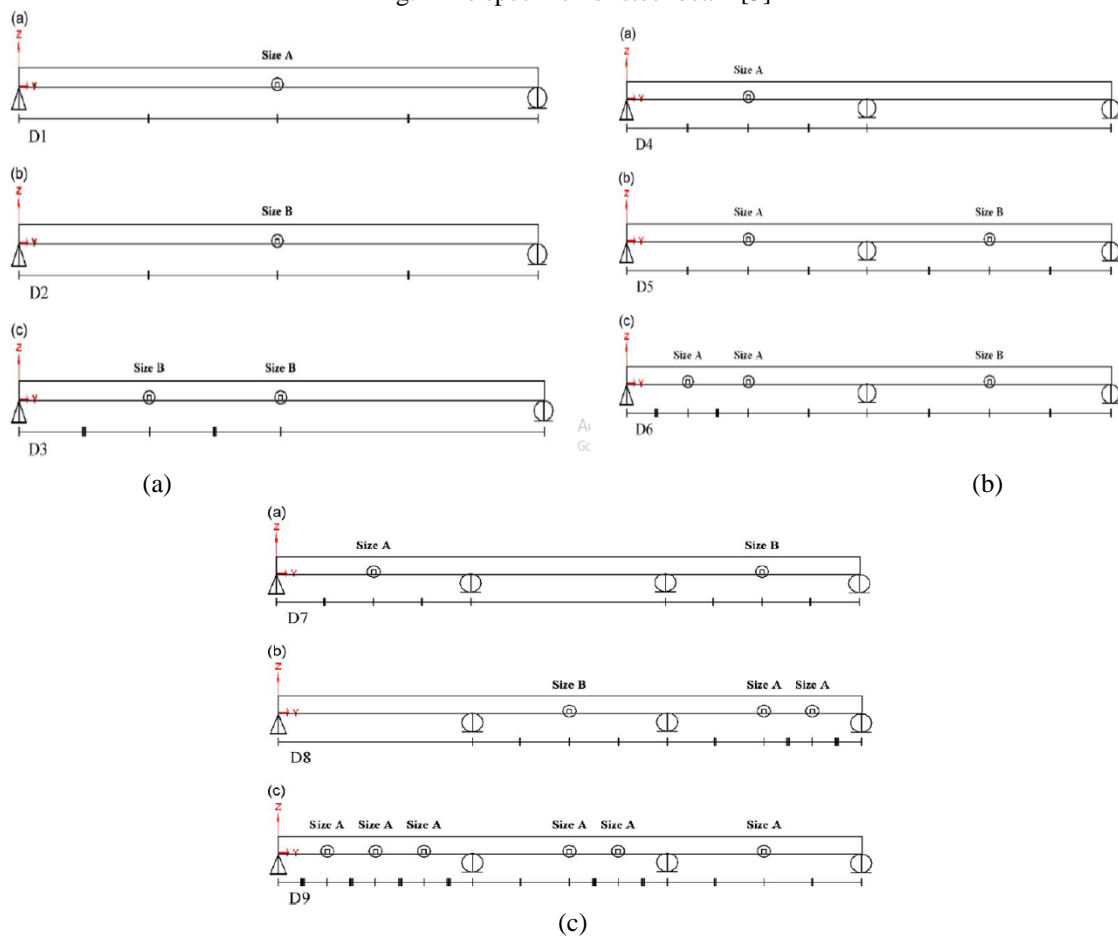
(a) Damage Case (D) for single span beam. (b) Damage Case (D) for 2-span beam. (c) Damage Case (D) for 3-span beam [4]
